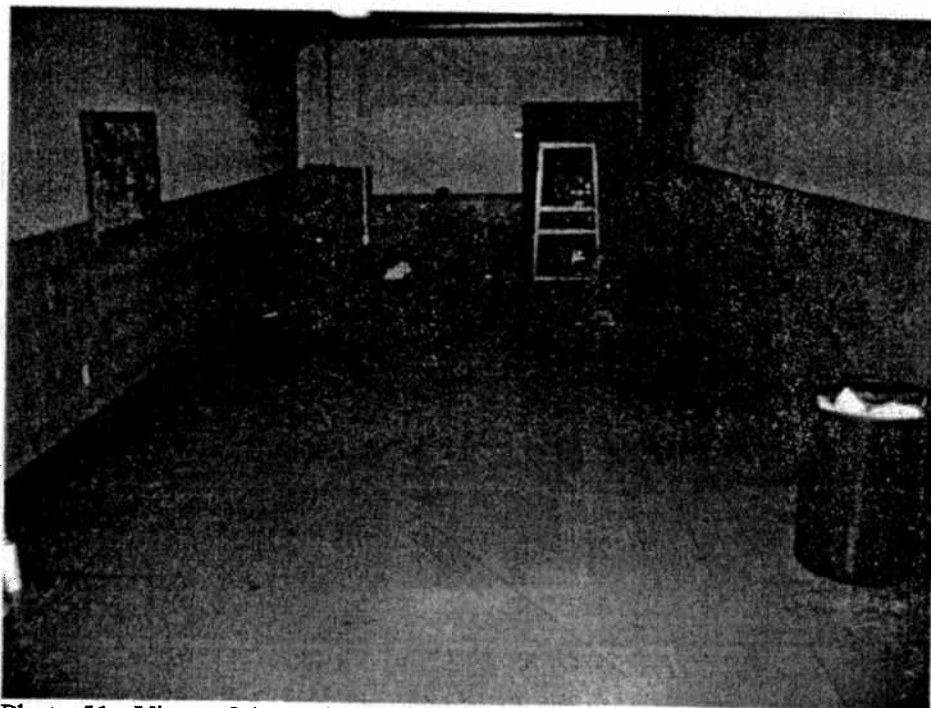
View of the weight room looking north from the entrance near the east central area of the drill floor. Note 9"x9" tiles on the floor.
